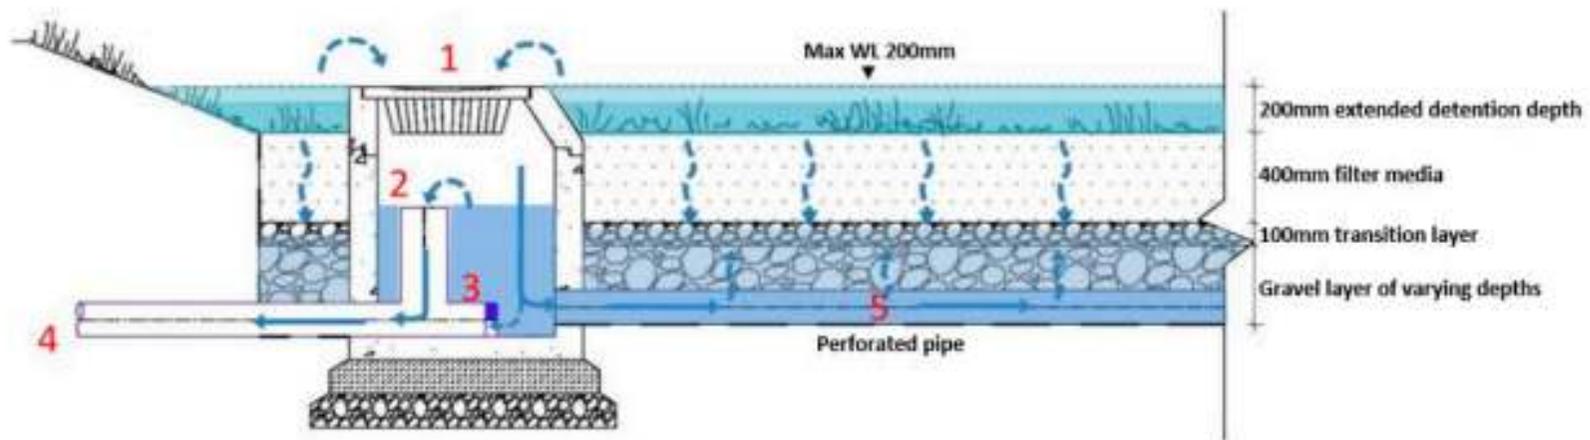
Cross section of a rain garden with overflow manhole in Waterway Ridges.
